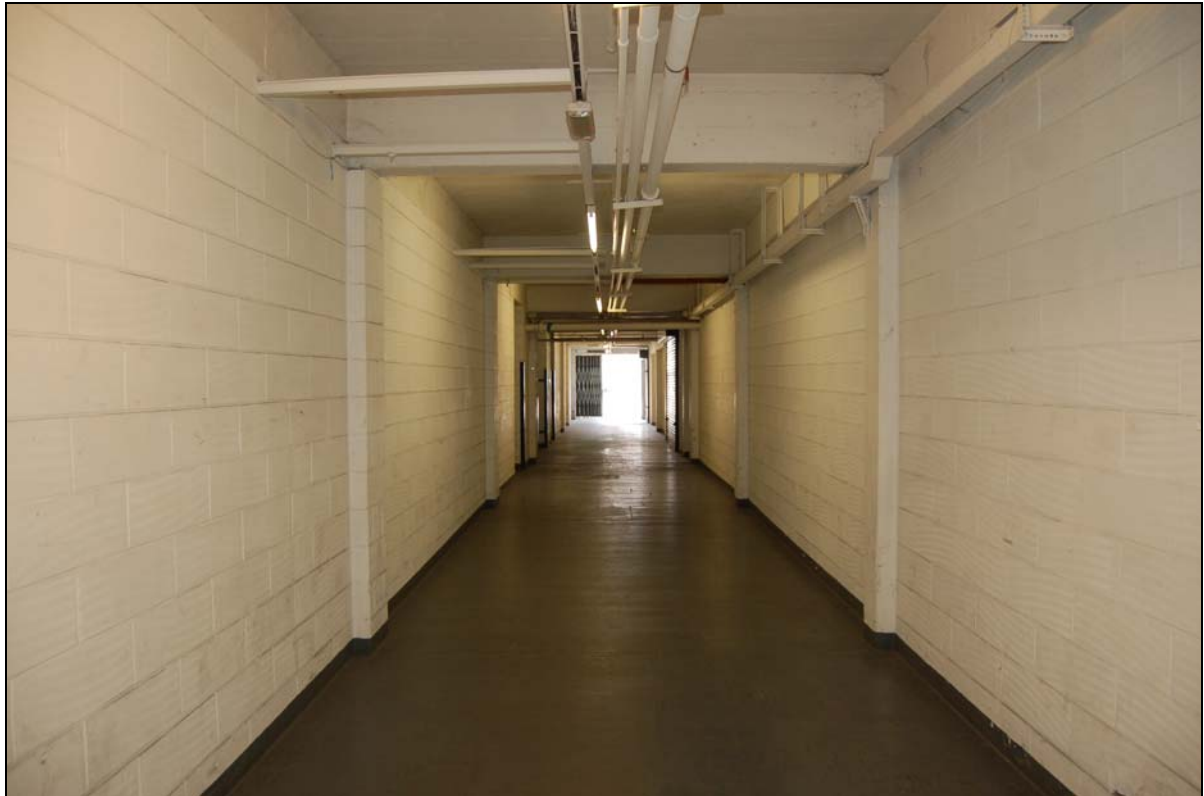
Building A, ground floor, central corridor looking towards exit (FCQ14-0035)
